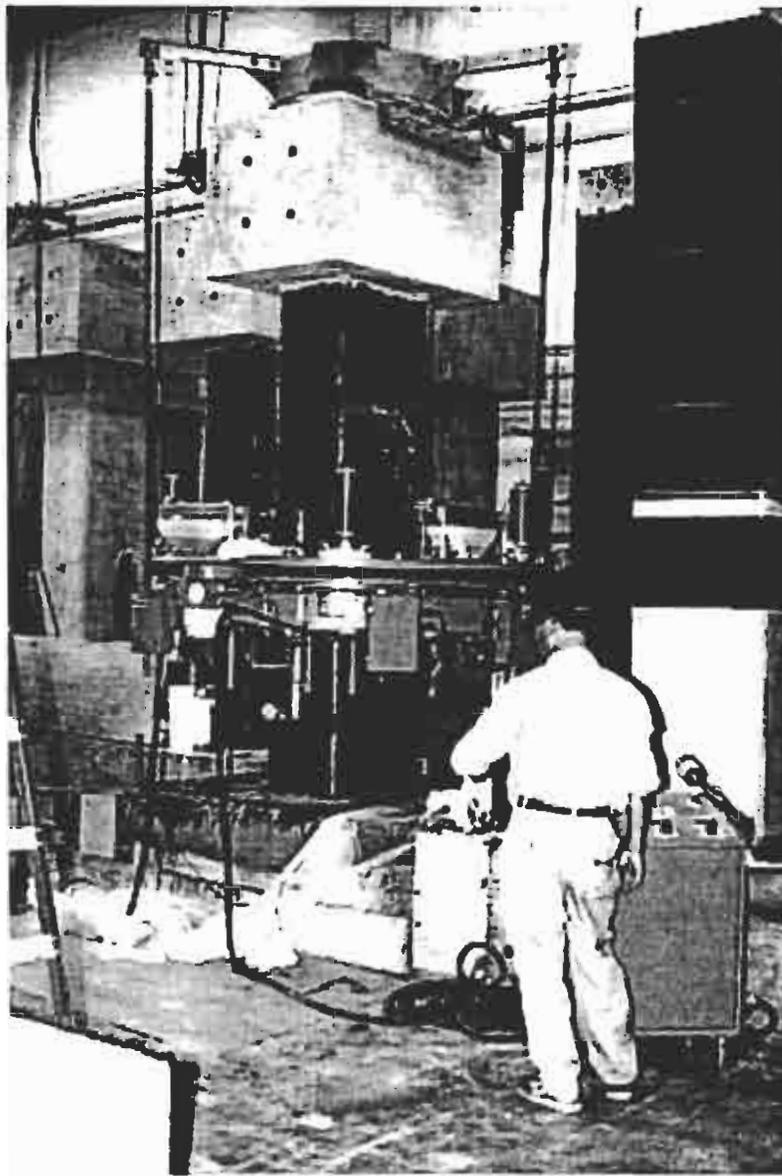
Jacket Application for Shear Enhancement Rectangular Column RS-2
